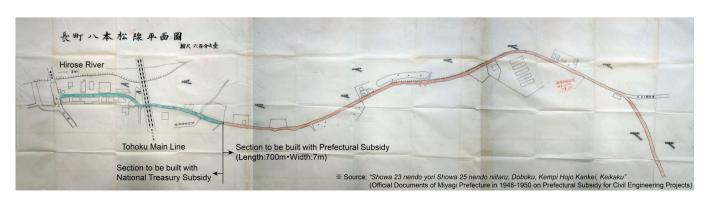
Plan of Nagamachi-Hachihommatsu Line [Colour figure can be viewed at wileyonlinelibrary.com]
